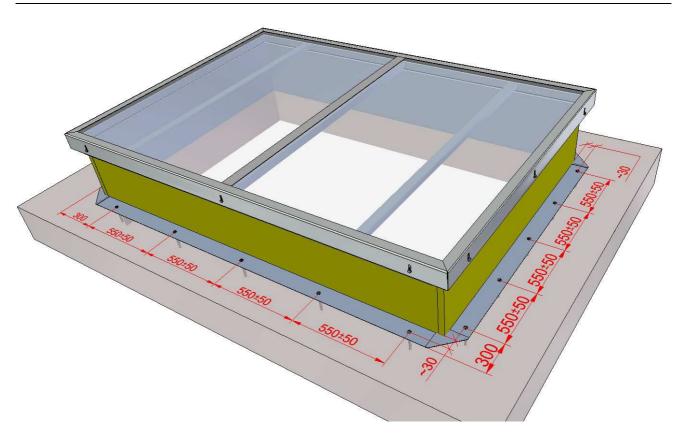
Method of setting mcr-PROLIGHT vent on the roof: connector spacing.
